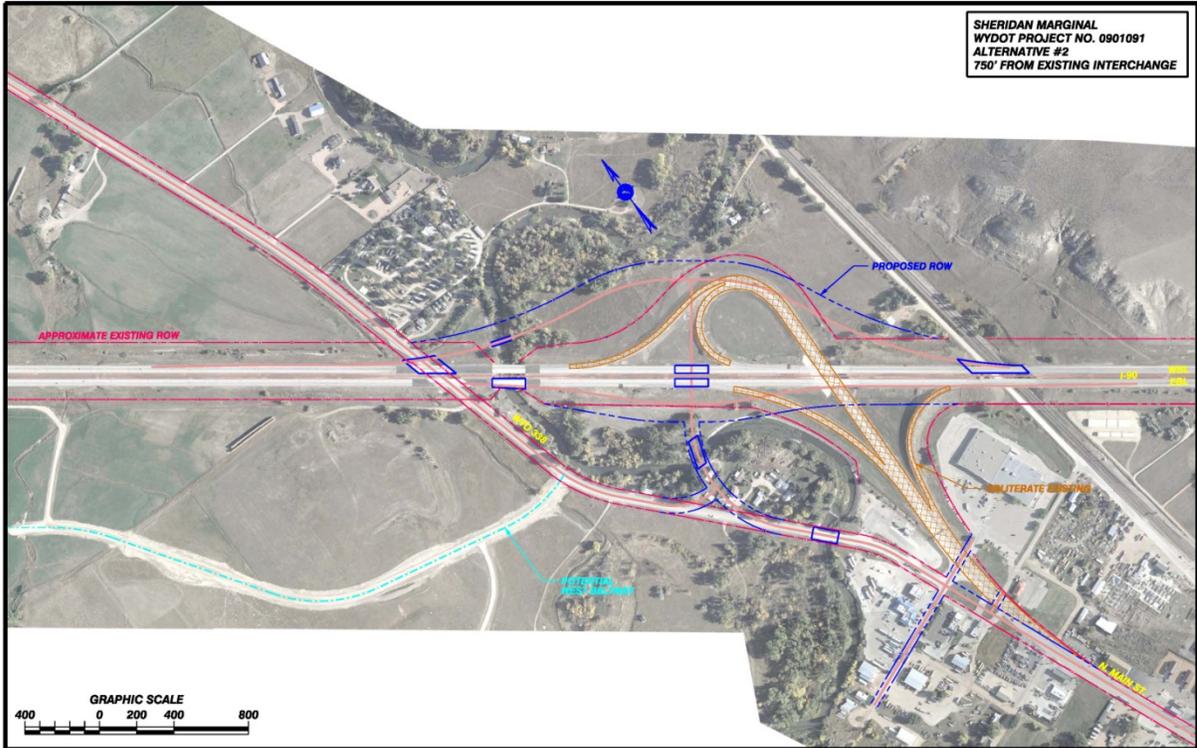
Alternative 2: Rebuild at the Existing Interchange. This alternative would construct a tight diamond interchange about 750 feet north of the existing interchange, and within the same general interchange footprint. The existing interchange would be demolished in order to build the new interchange.
